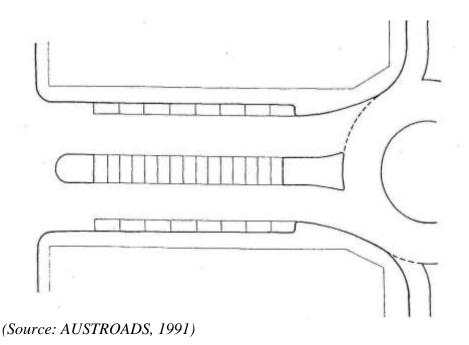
Typical centre of the road parking layout for low flow situations
